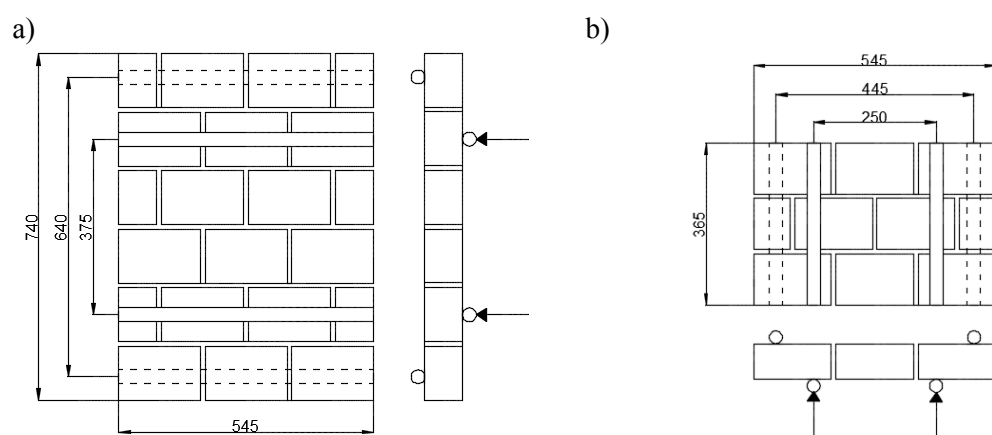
Dimension of brick masonry under flexure a) parallel to bed joints b) perpendicular to bed joints
